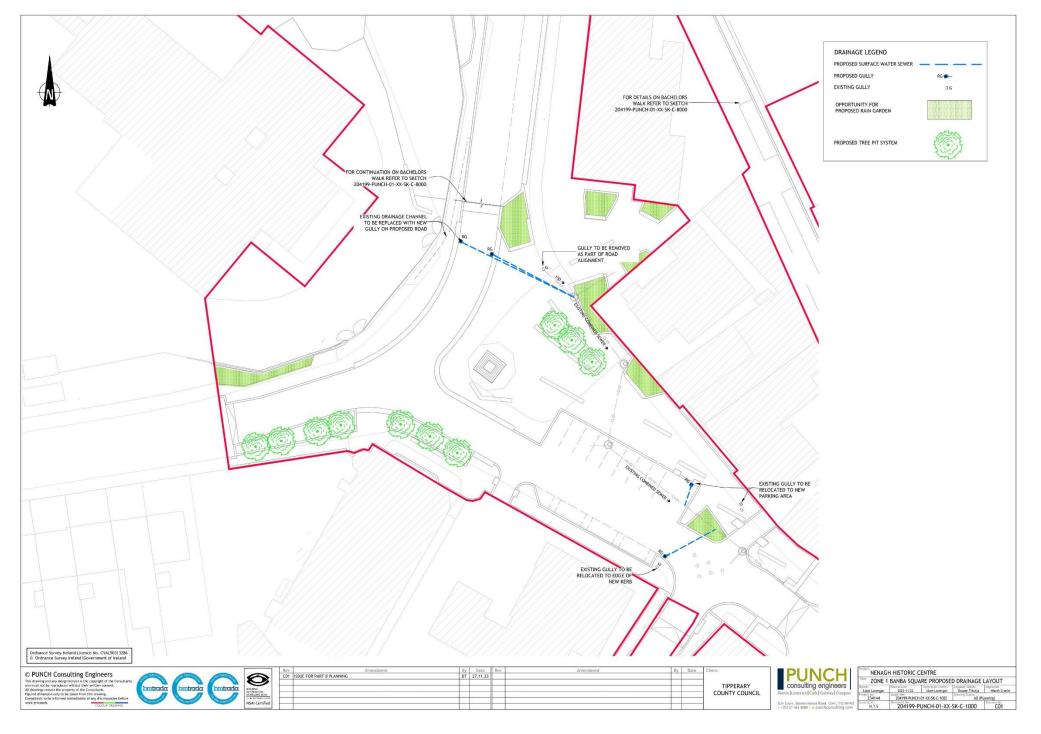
Proposed Stormwater Drainage Banba Square (NHCQ Zone 1)
